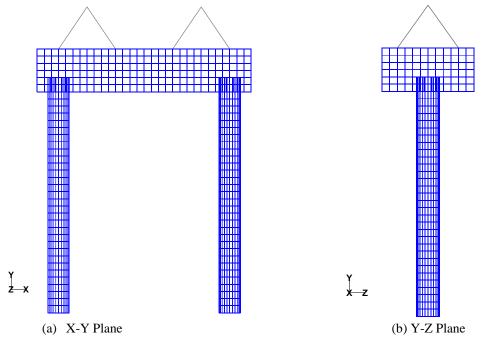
2D View of Hollow Block Foundation with Pileswith Piles Model for Blower Machine in STAAD.Pro
